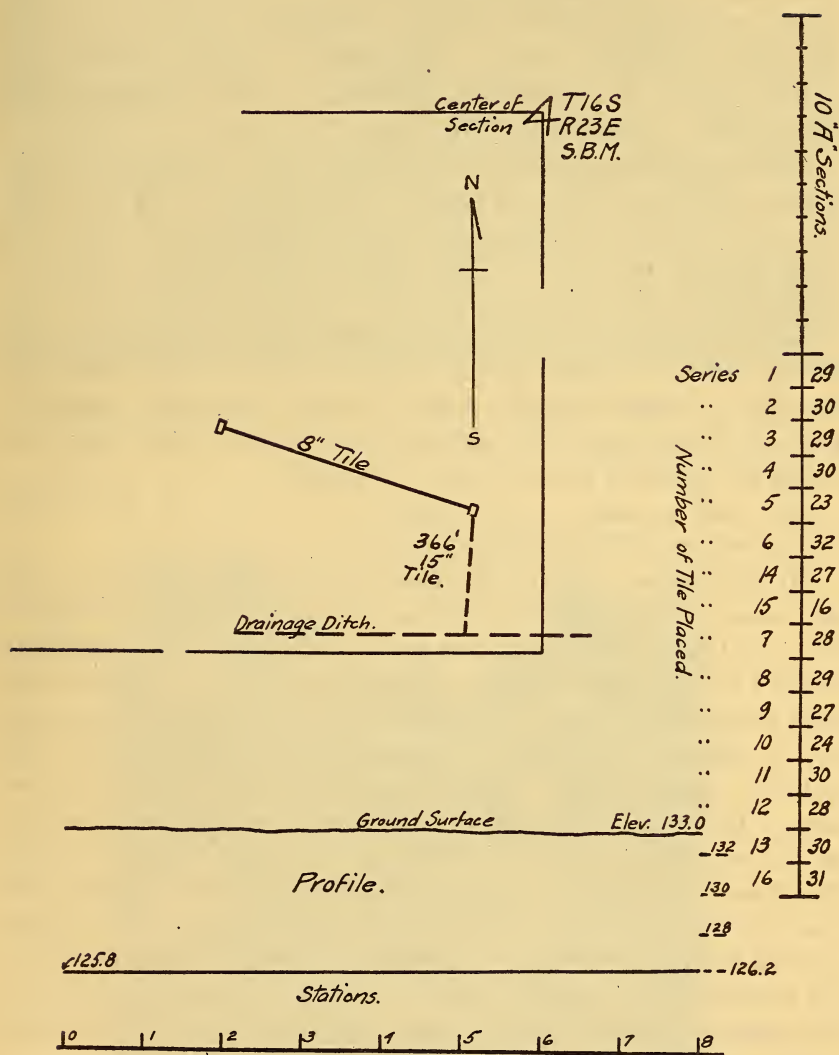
Showing location, plan, profile, and arrangement of experimental drain tile at Yuma, Ariz.
